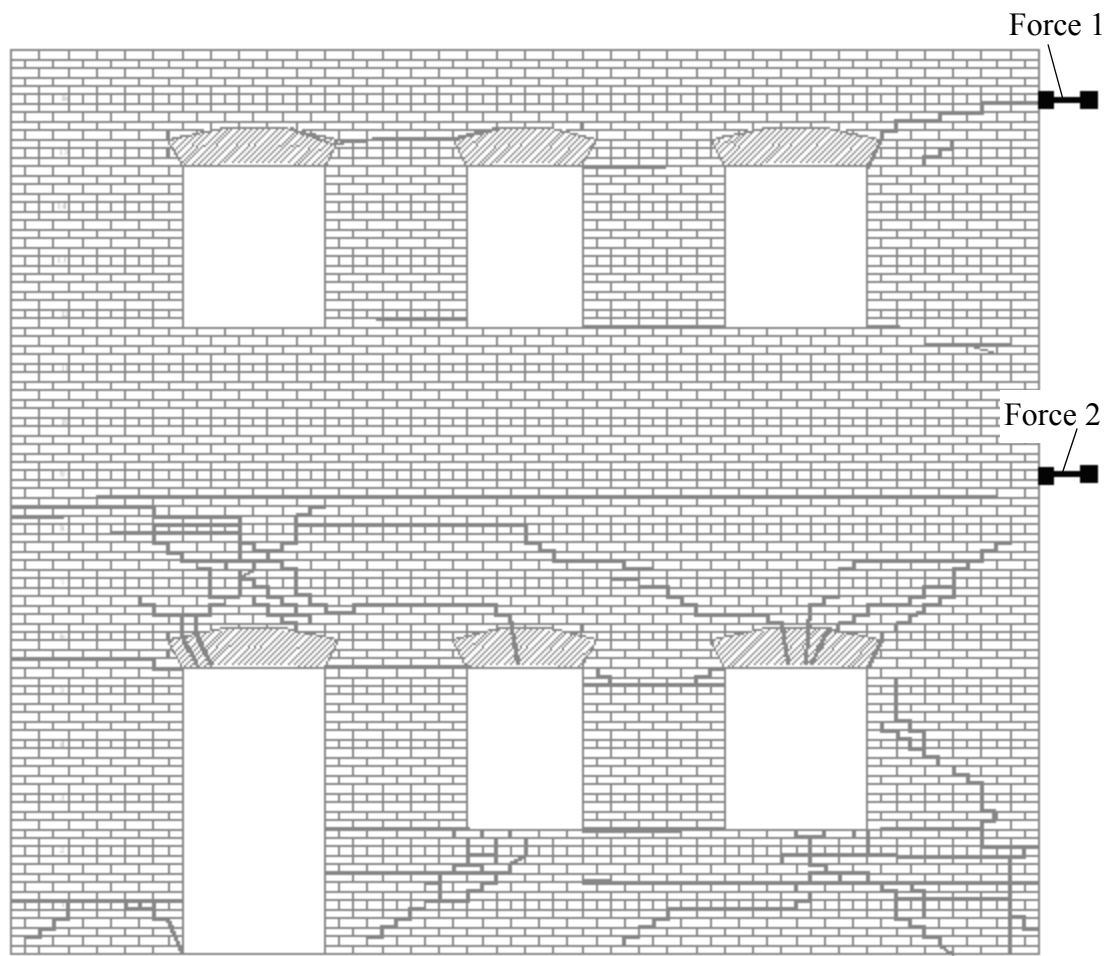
Elevation of Wall B illustrating the location of load cells.
